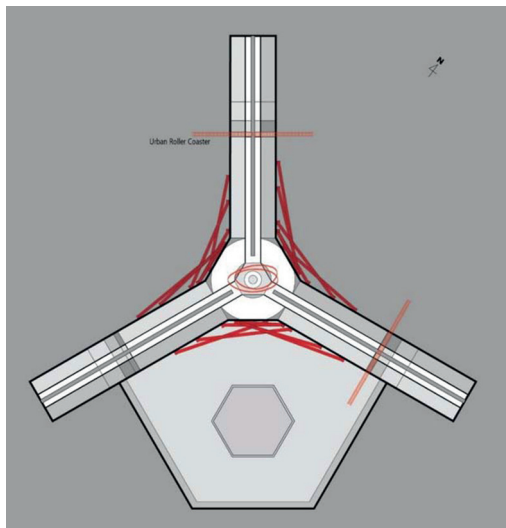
Jae Ho Lee, Ryugyong Tower, plan, tunnel and slides, Pyongyang, 2050.
